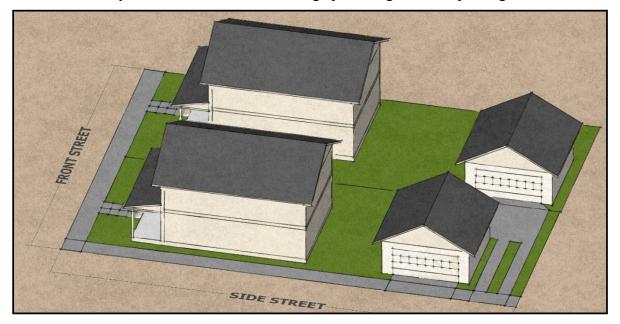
Example Providing Access to Side Street via Easement/Lot Configuration
